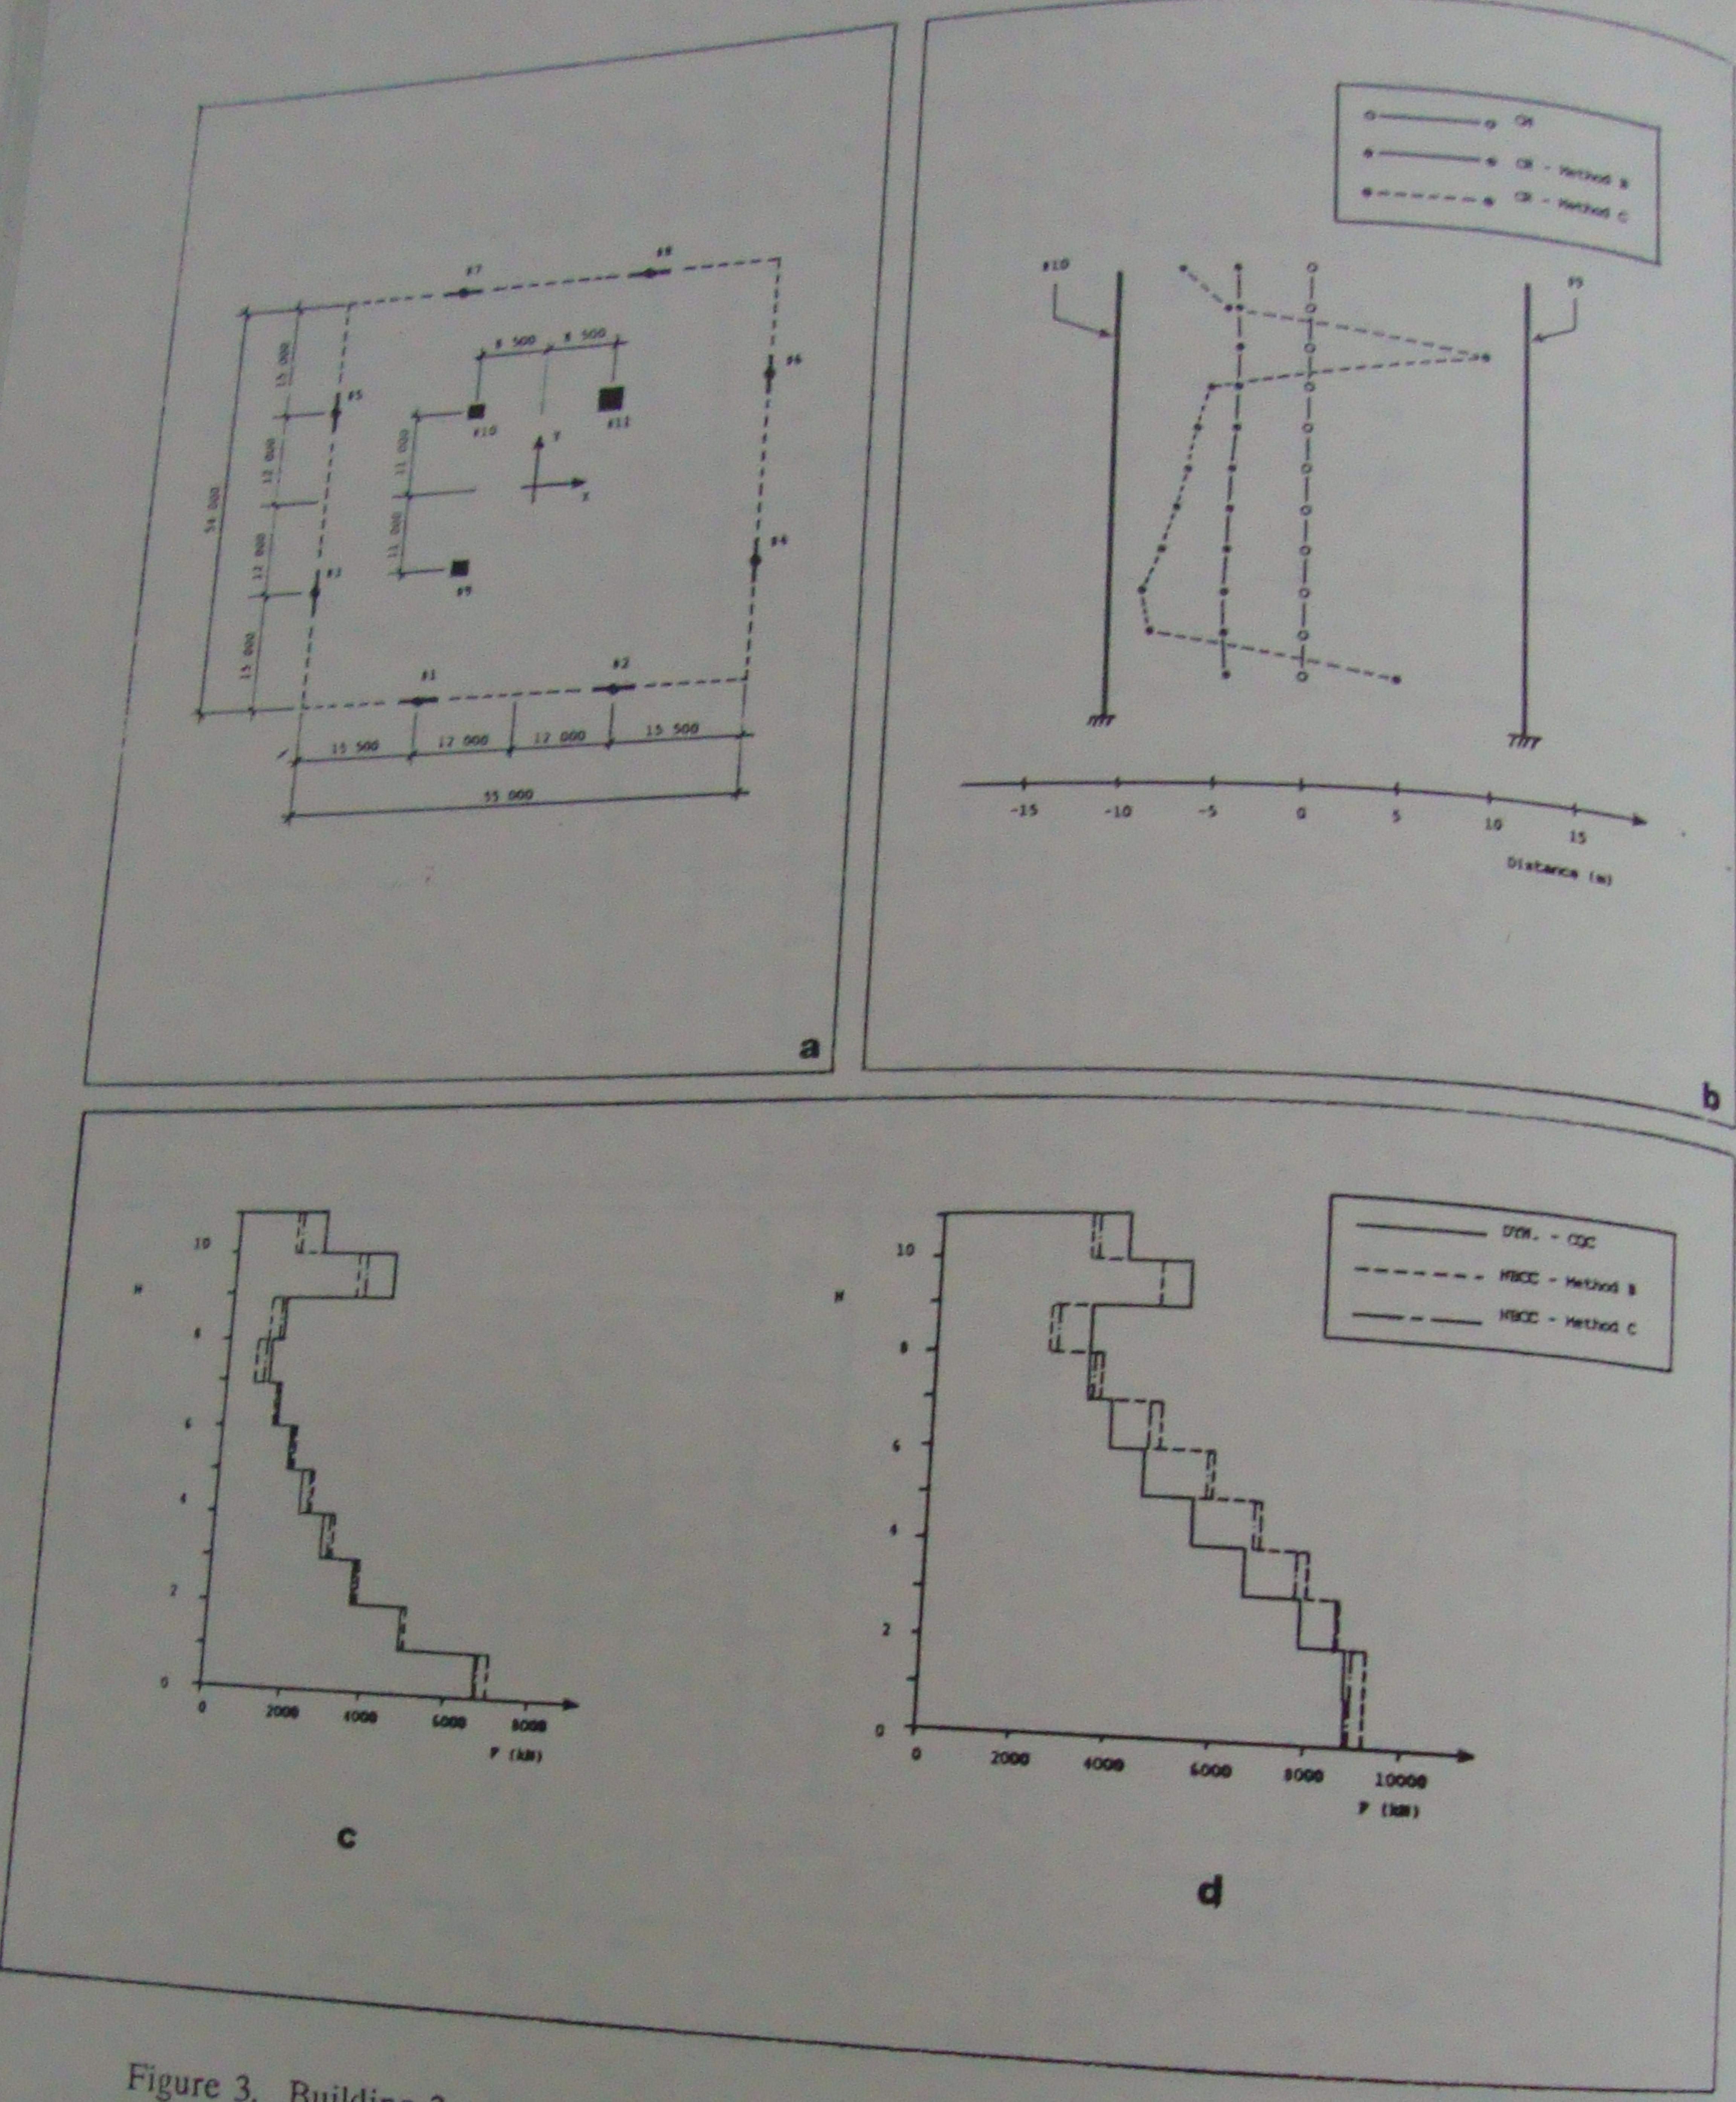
Building 3 - 11 stories. (a) plan; (b) position of CM and CR in Y-Z plane; (c) shears in element #9; (d) shears in element #11.
